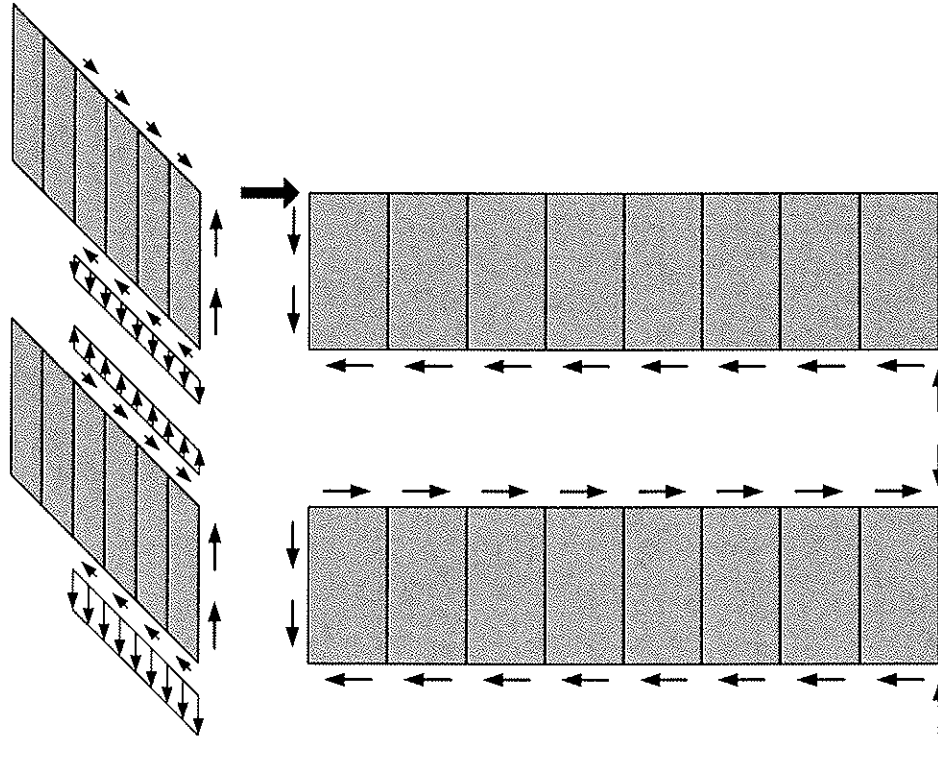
Assumed external and internal forces acting on a two-storey wall diaphragm connected to a transverse wall with fully anchored bottom rail.
